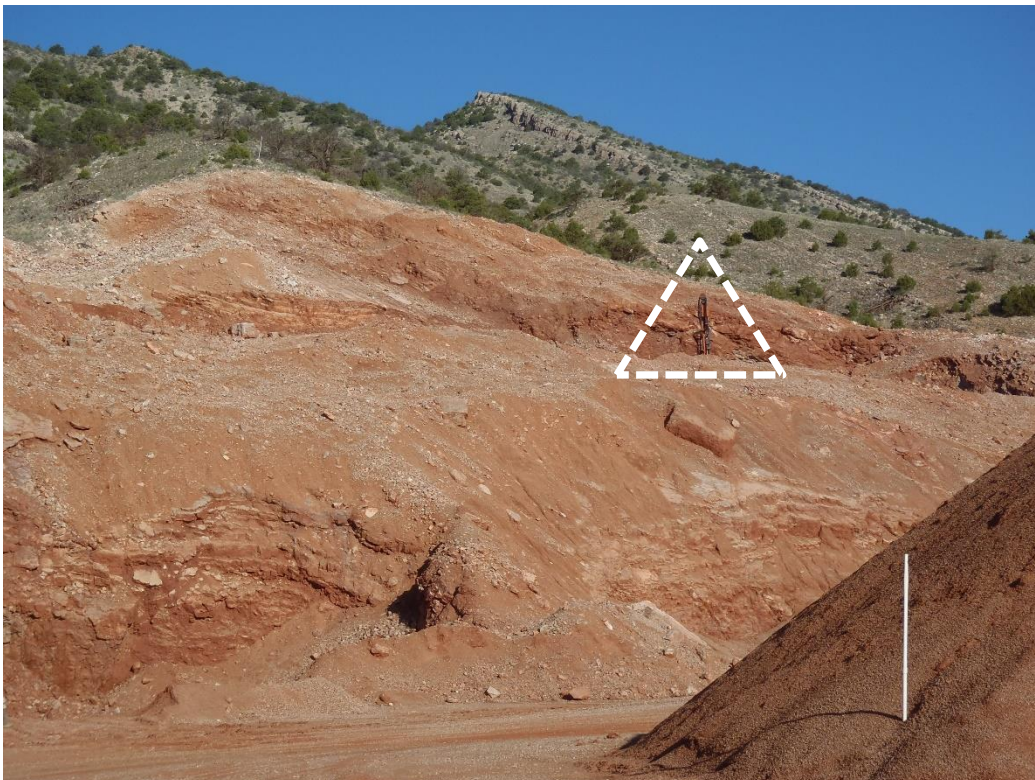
Drill rig mast where blast holes were being drilled south end (looking NW).
